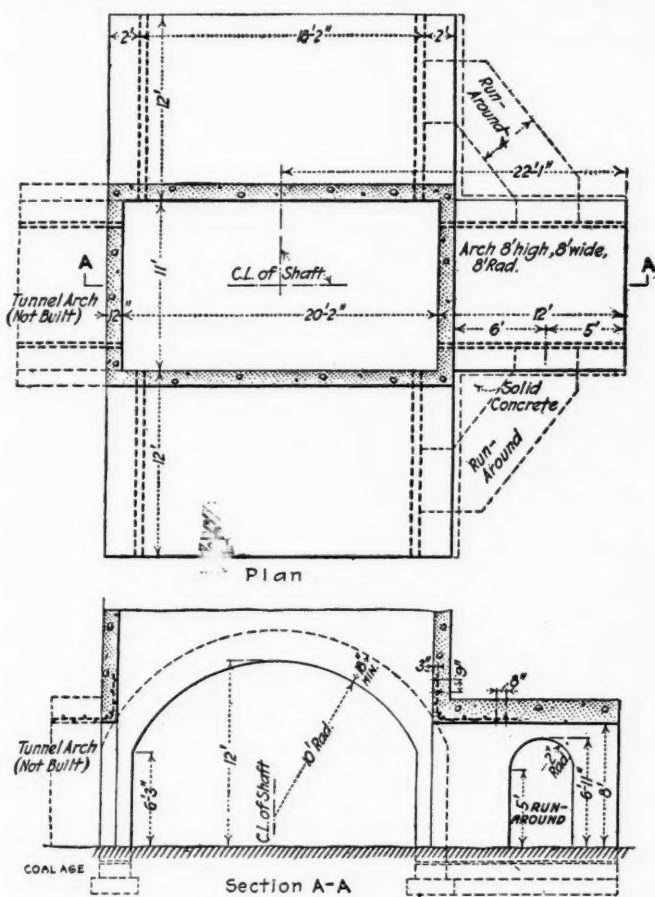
PLAN AND SECTION OF MAIN SHAFT BOTTOM APPROACH ARCHES
